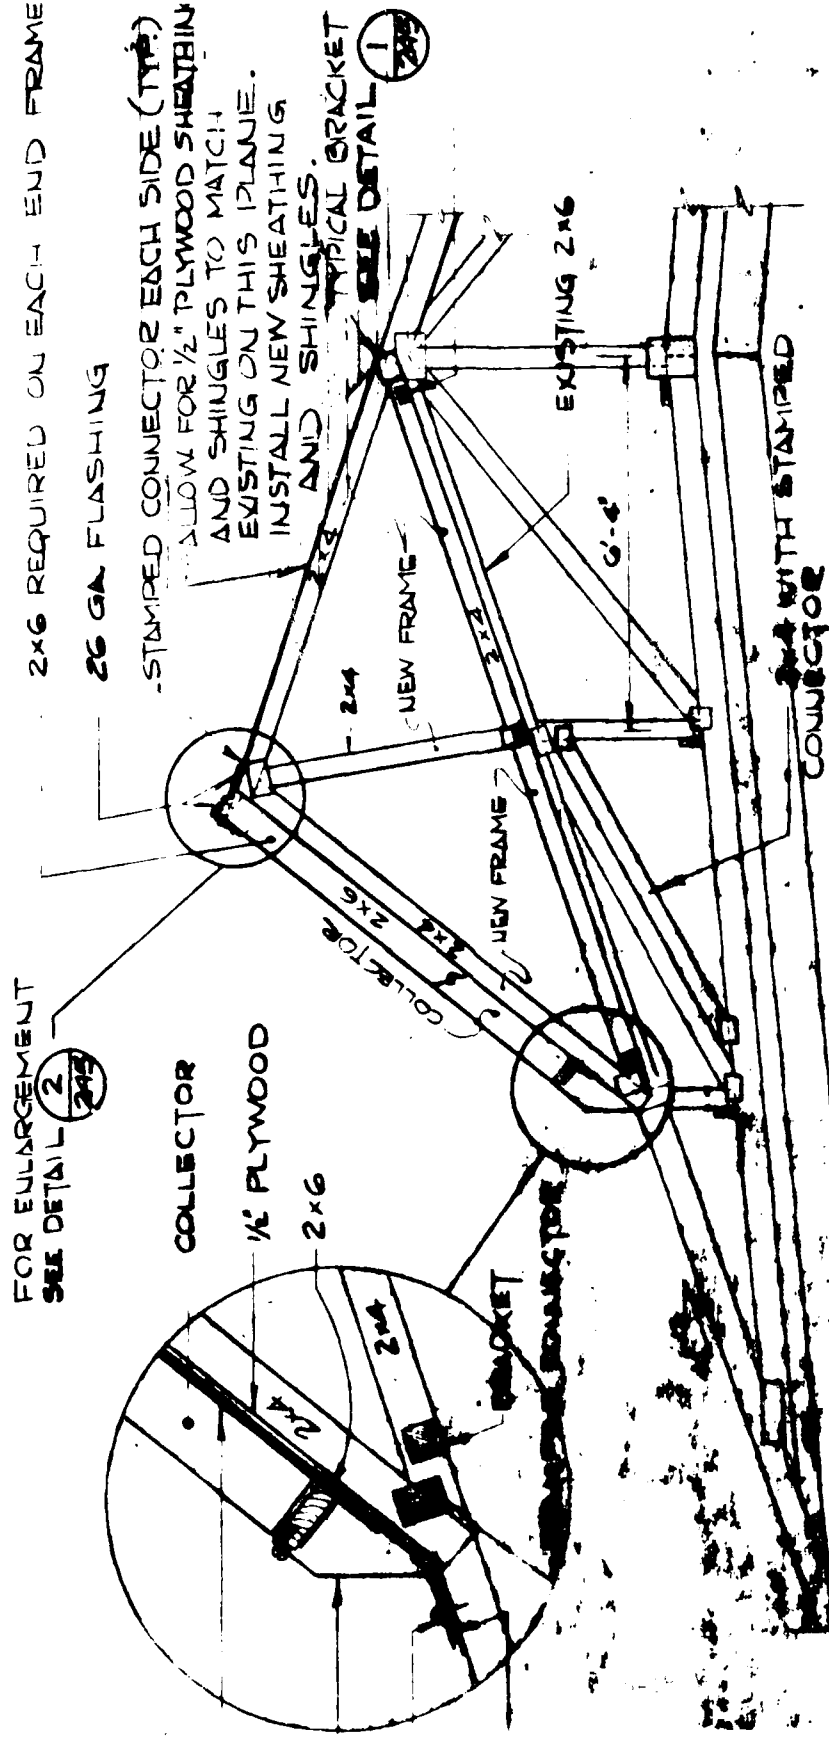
ROOF ARRAY ANCHORING DETAIL
